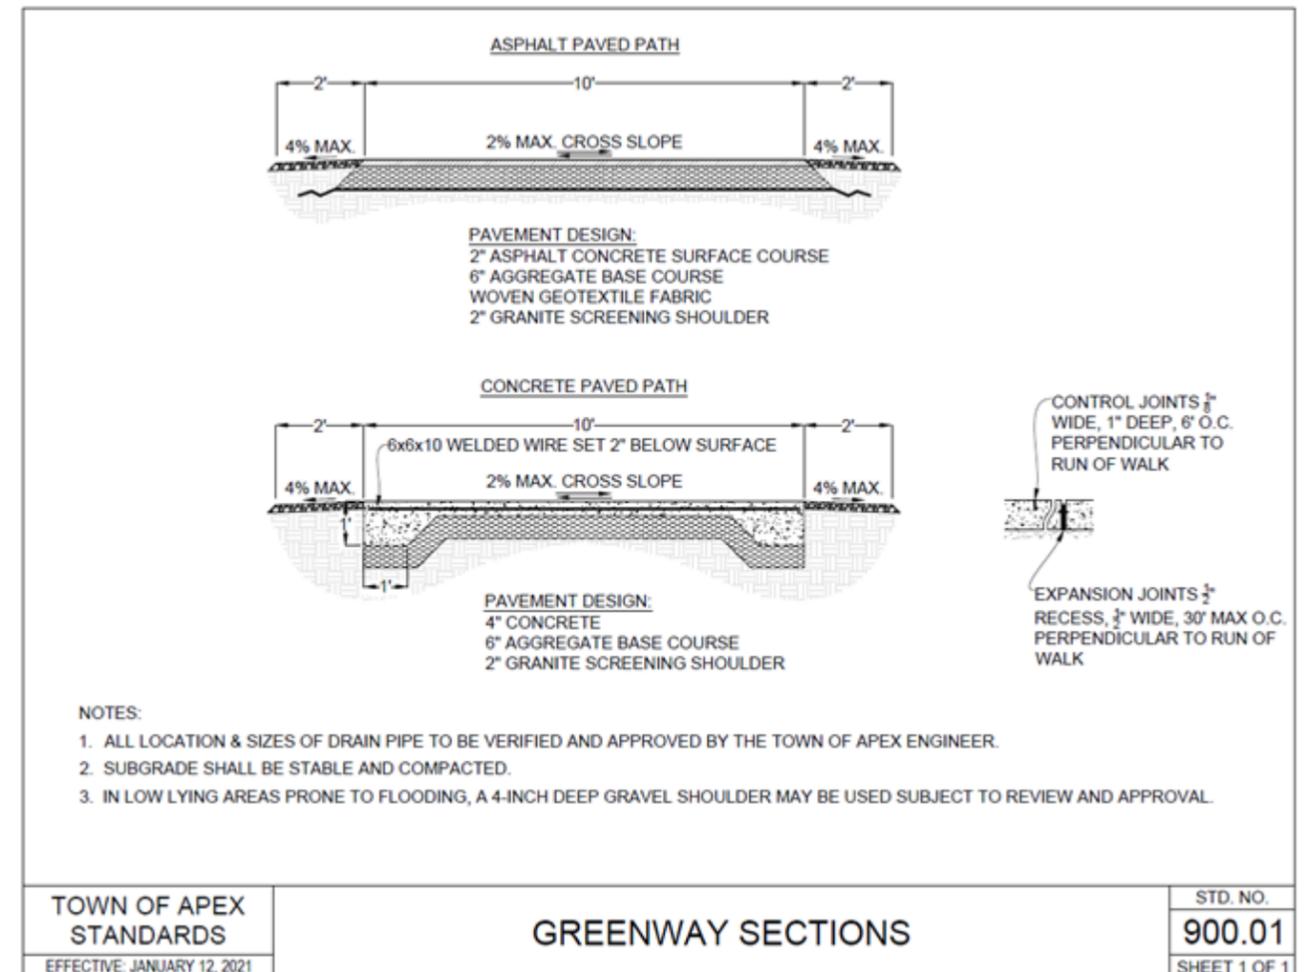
Existing Design Standard for Greenways / Town of Apex
